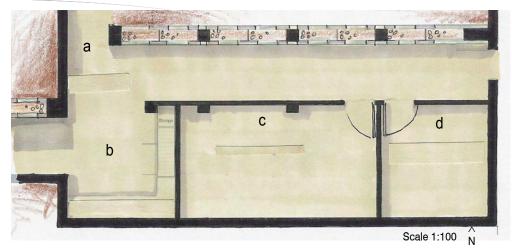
Plan of administrative spaces (see section 7, New Plan). a – Main Parrot feeding Schedule Zone; b – Main Parrot Food Preparation Zone; c – Training and Meeting Office; d – Breeding and Conservation Office.
